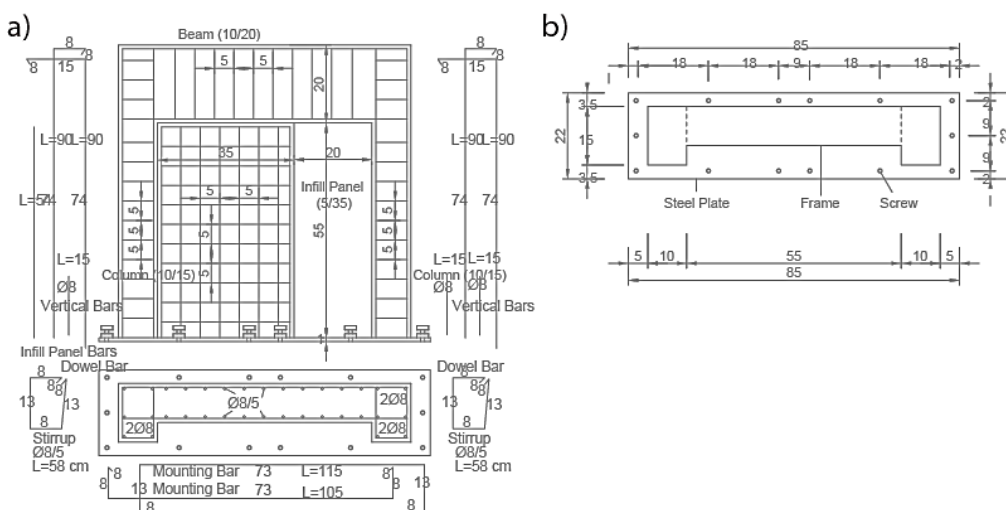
a) Reinforcement layout for Spc 2 b) Details of steel base plate
